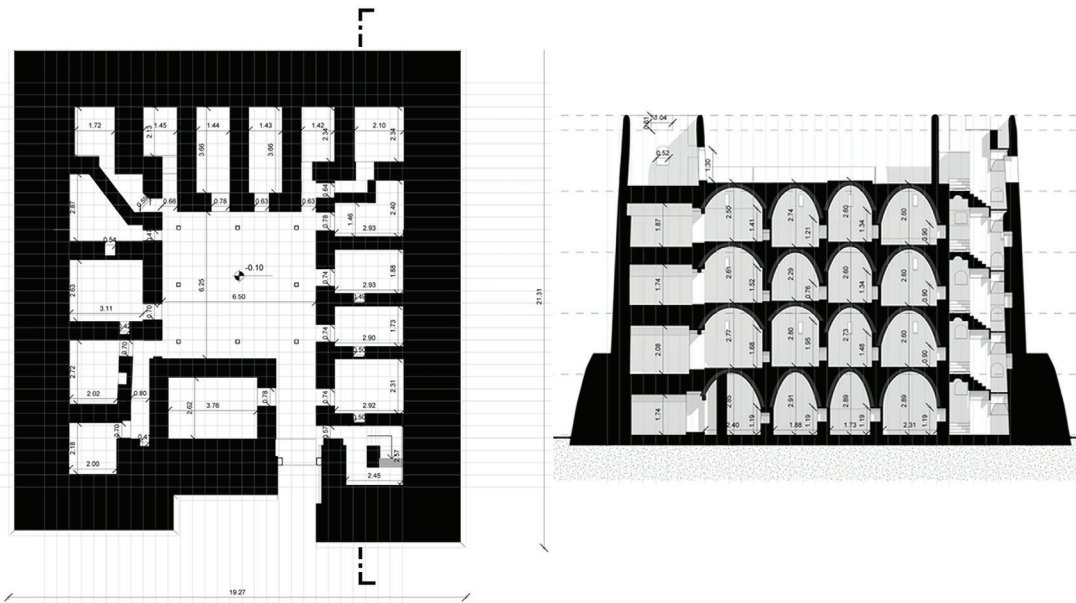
Ground level floor plan and N-S section (on the staircase) looking east of the reconstructed fort. A modular grid of 52 cm (reformed Egyptian cubit) was superimposed.
